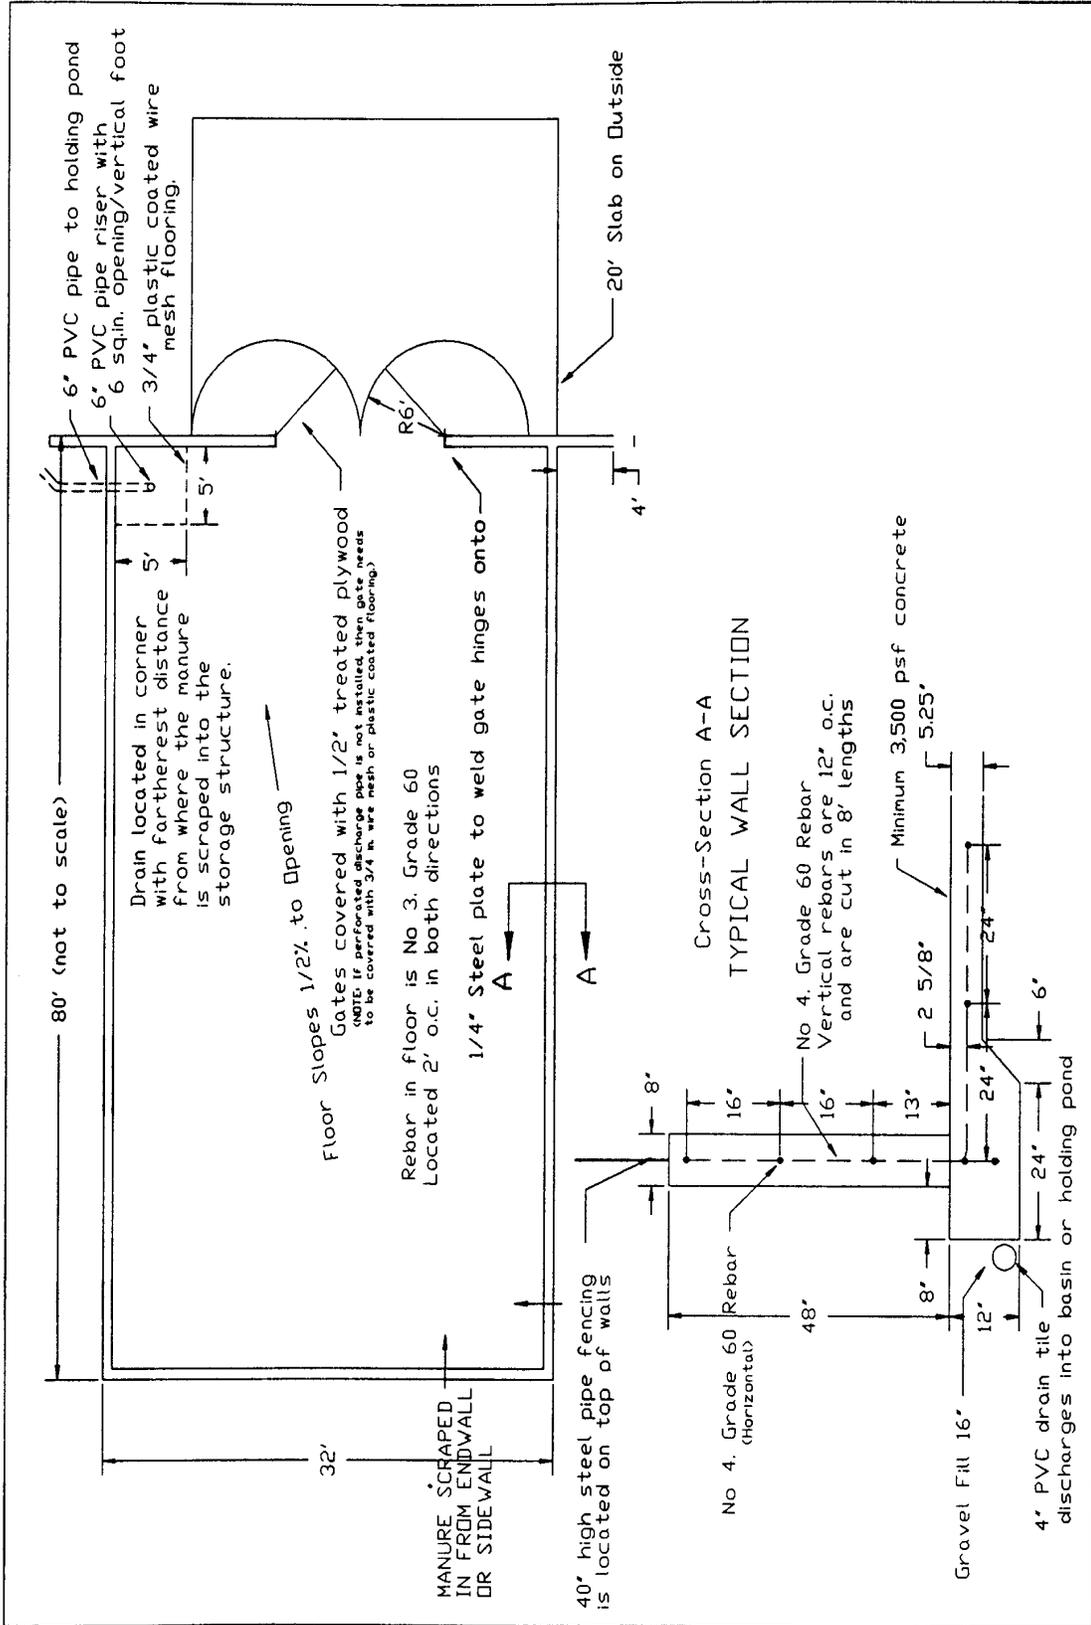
Concrete Level Bottom and Concrete Sidewall Structure
